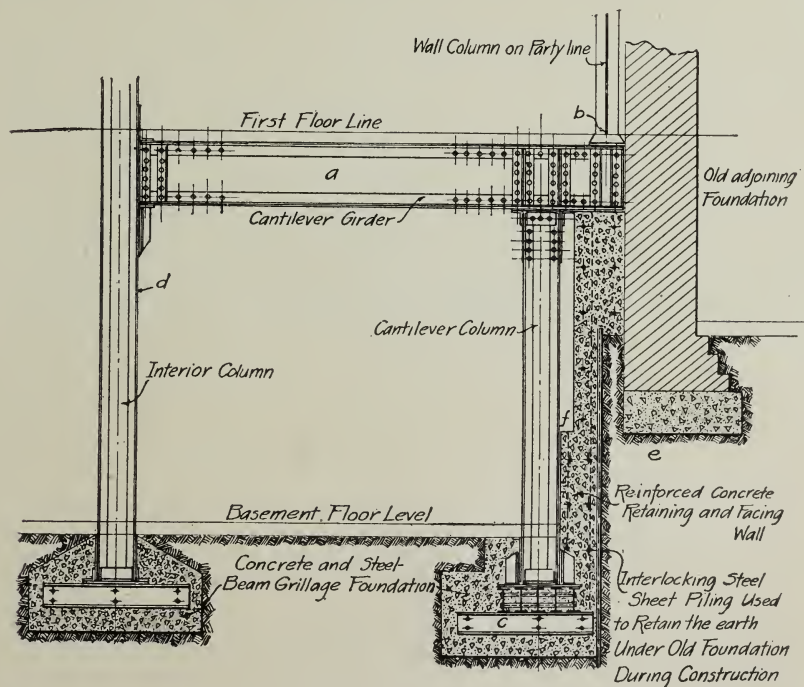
Example of Cantilever Foundation Construction. Basement Head-room Retained.
